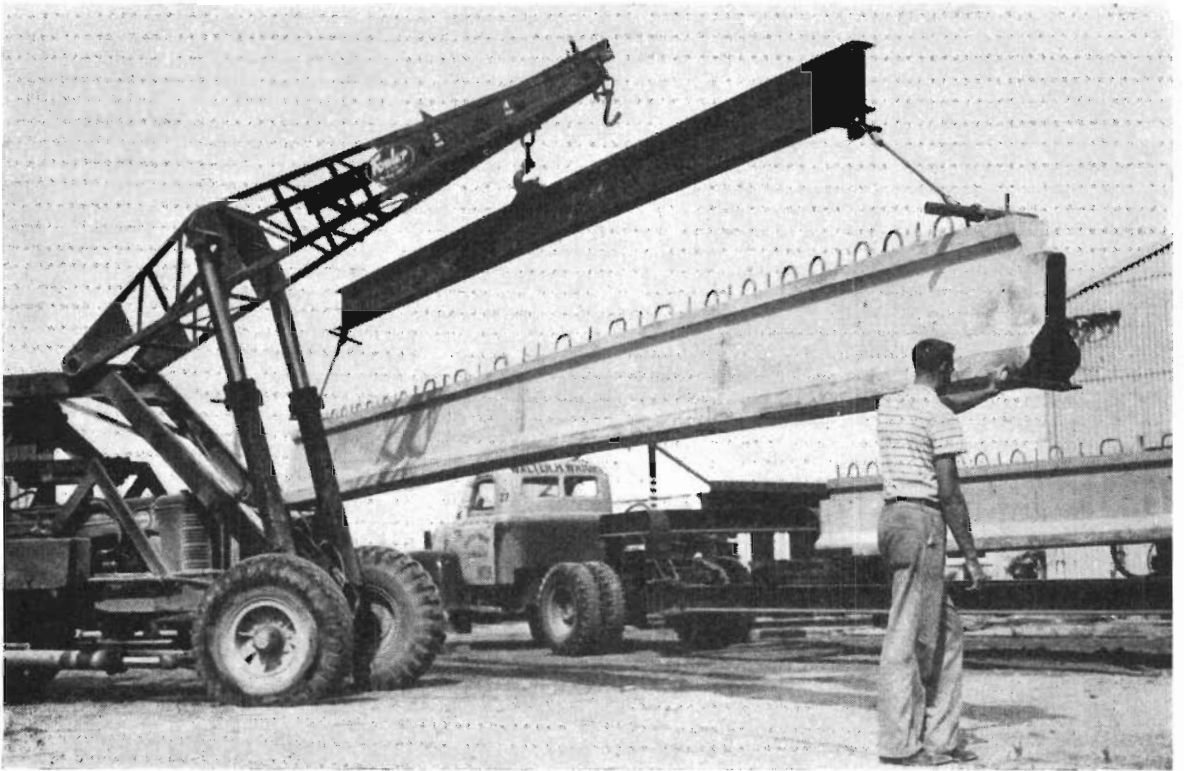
Loading 40-ft. span prestressed, precast concrete beam for transport to bridge over Kororoit Creek on Kororoit Creek main road.
